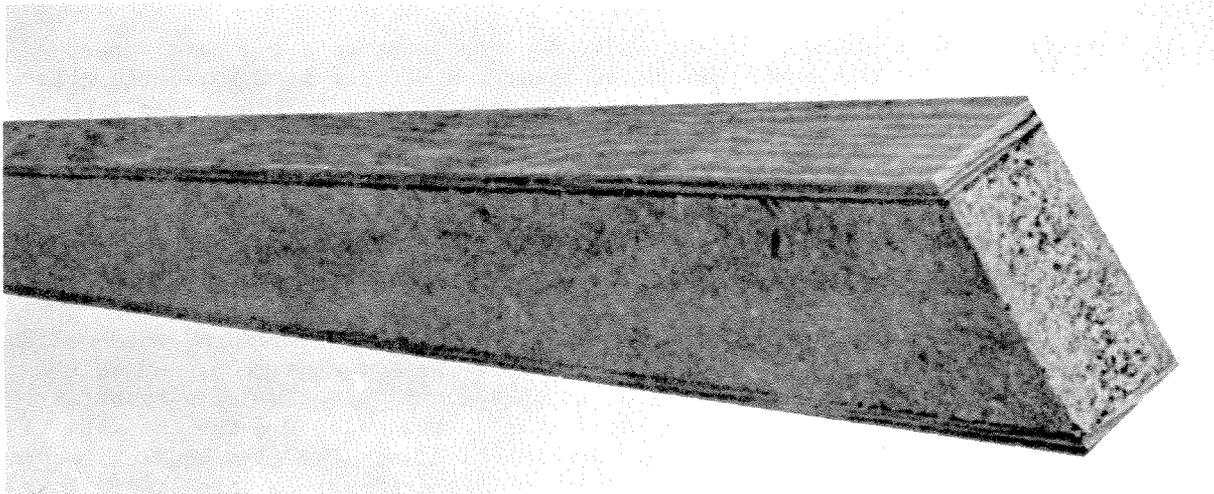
COM-PLY stud used for framing exterior walls of houses.
